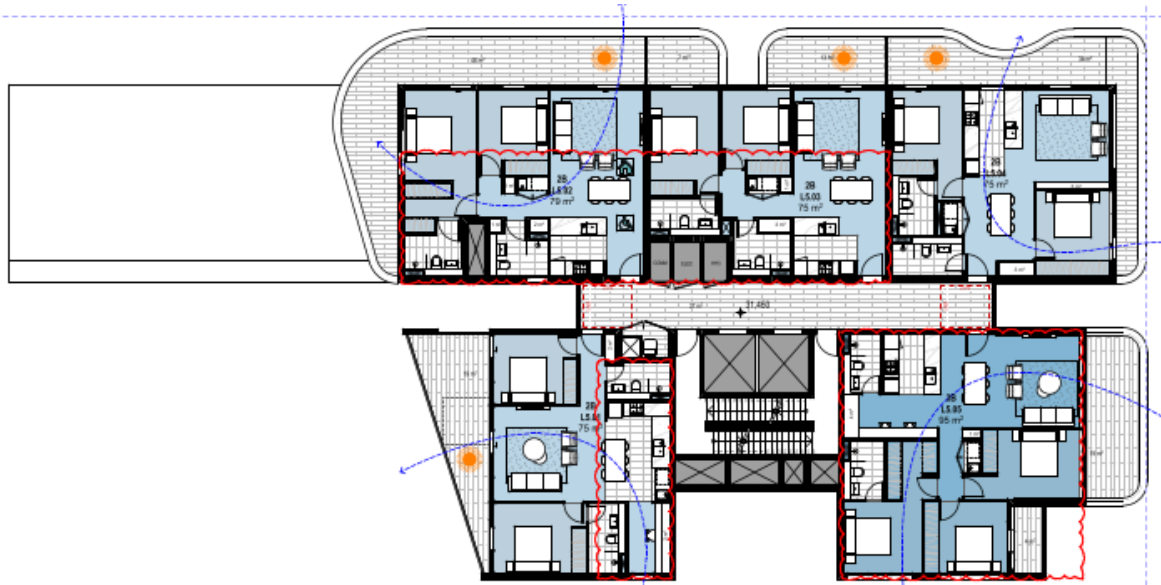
Extract of the proposed floor plan of Level 5 in the current modification application.
